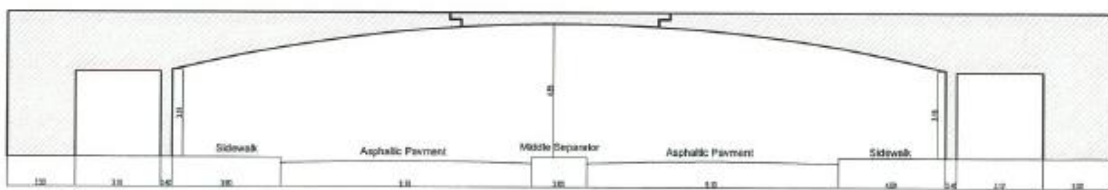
Disposition of simple beam slab in the span of bridge (Section 7-7)
